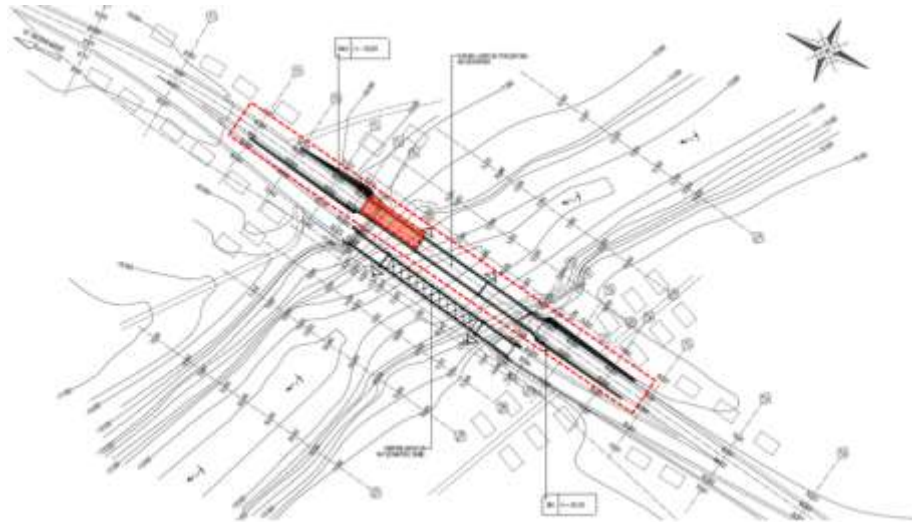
Location and span of the Way Sekampung Bridge to be tested
